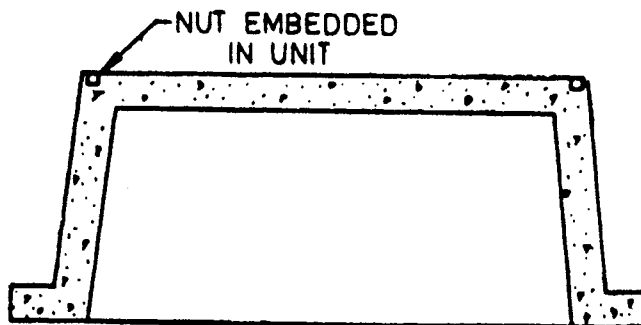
TYPICAL SQUARE WAFFLE SLAB UNIT
